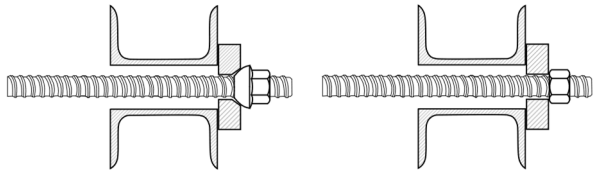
Illustration of a spherical nut (left) and a flat nut (right) each connecting the anchor tie rod to a stretch which is installed on the sheet pile wall.
